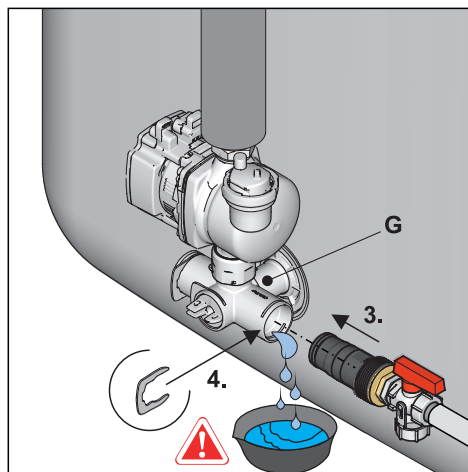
Installing the combined filling and draining filling connection in the connection bracket
